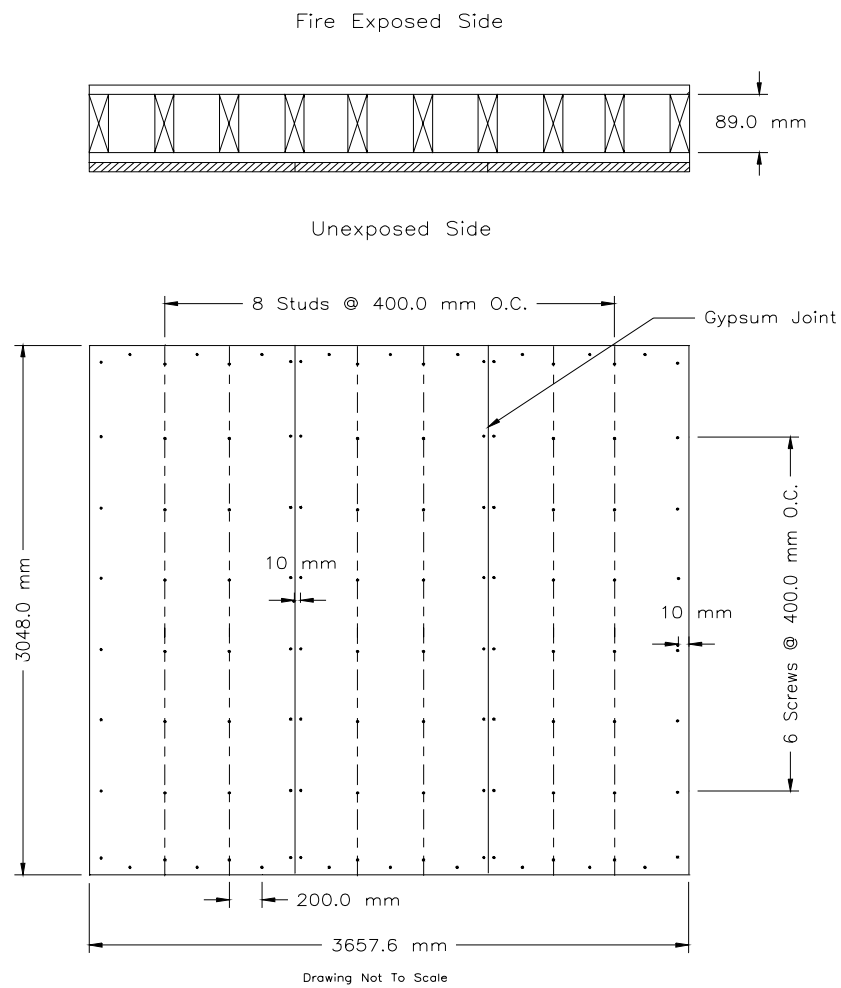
Screw Locations For Wood Stud, 1x2 Gypsum Board Layers, Full-Scale Assembly (Face Layer, Unexposed Side)
